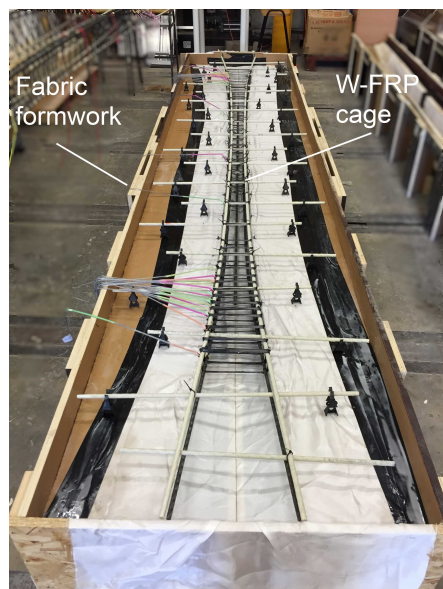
Fabric formwork and W-FRP cage of T2-1 before casting
